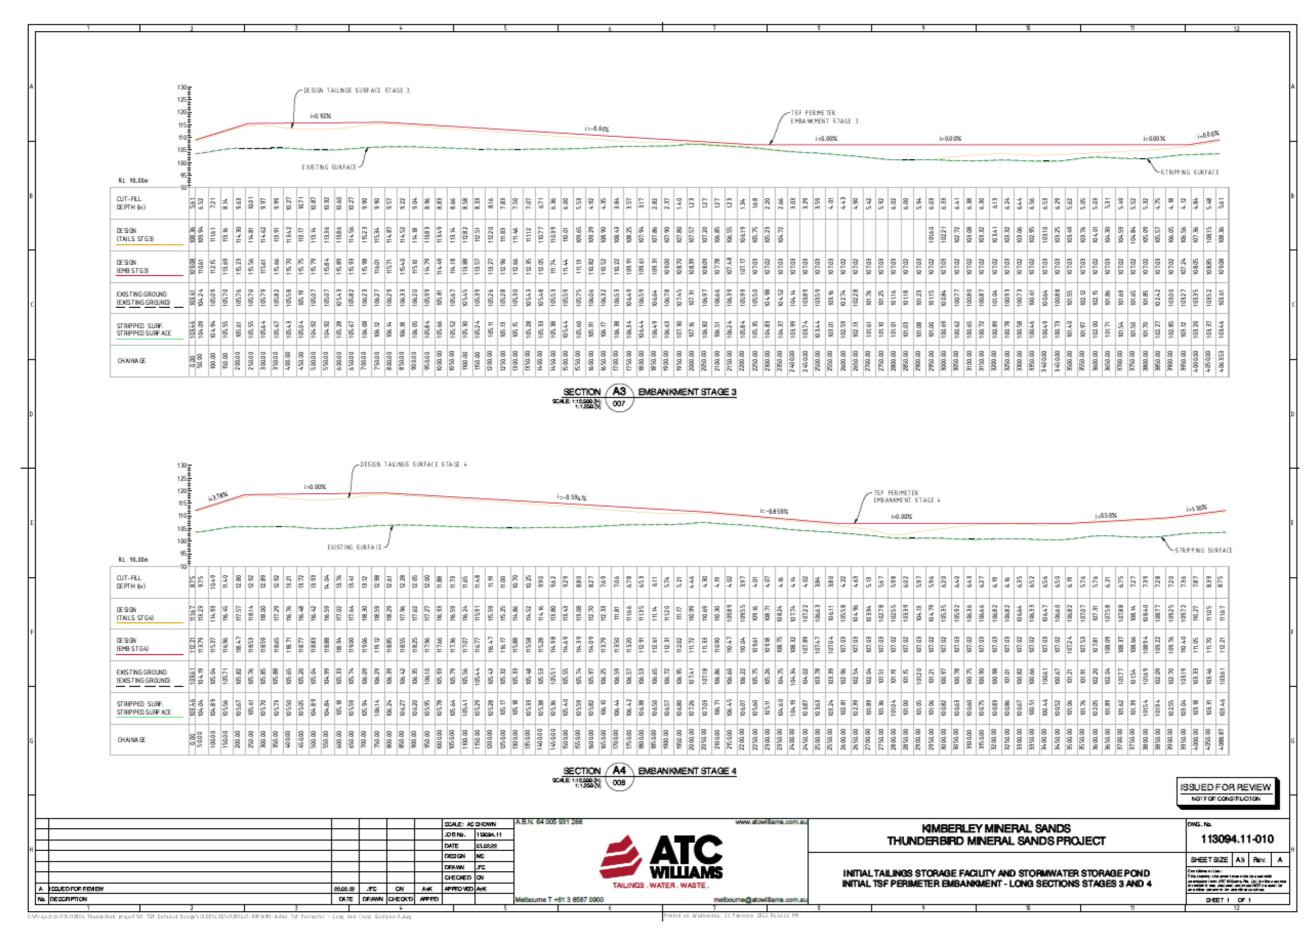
Drawing – Initial TSF and SPP, TSF perimeter embankment, long sections stages 3 and 4
